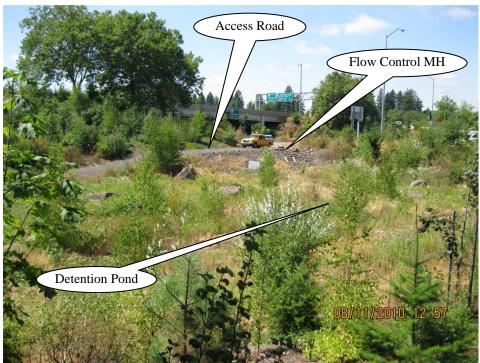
Looking southwest at the detention pond/basin, the access road and the outlet control structure.
